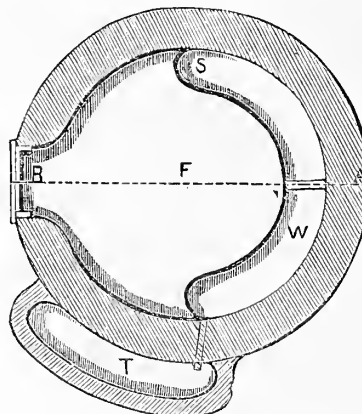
THE GROUND PLAN OF SPRING HOUSE.
